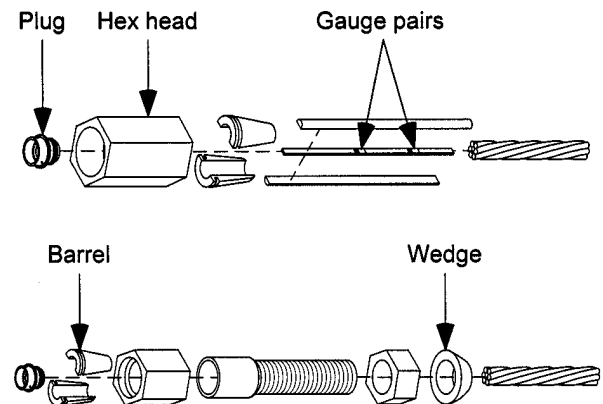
Instrumented cable bolt assembly with and without pretension head.
